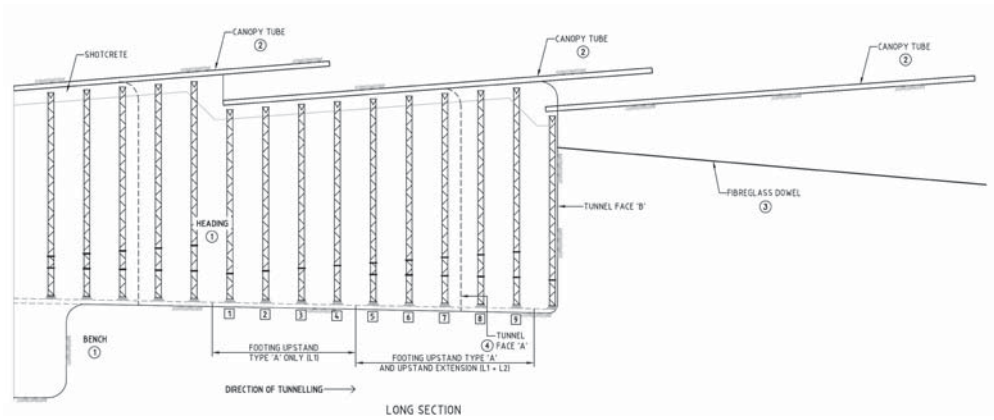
Long section of the tunnel with lattice girders and canopy tubes shown.
